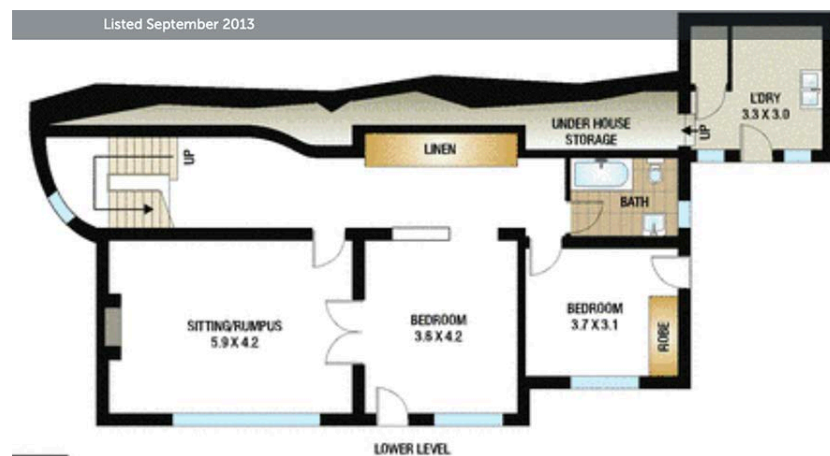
55 Drumalbyn Road, Bellevue Hill, Ground Floor (lower level) Plan. Architect: P. Gordon Craig & John M. Brindley, 1937. (Source: realestate.com.au: BradfieldCleary, 55 Drumalbyn Road, Bellevue Hill, sold 18 October 2013)
